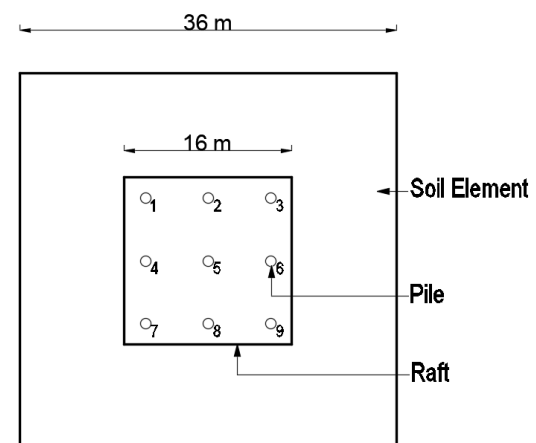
Position of Piles in Piled Raft Foundation-Type C- Pile directly below the column (9 nos. of piles)
